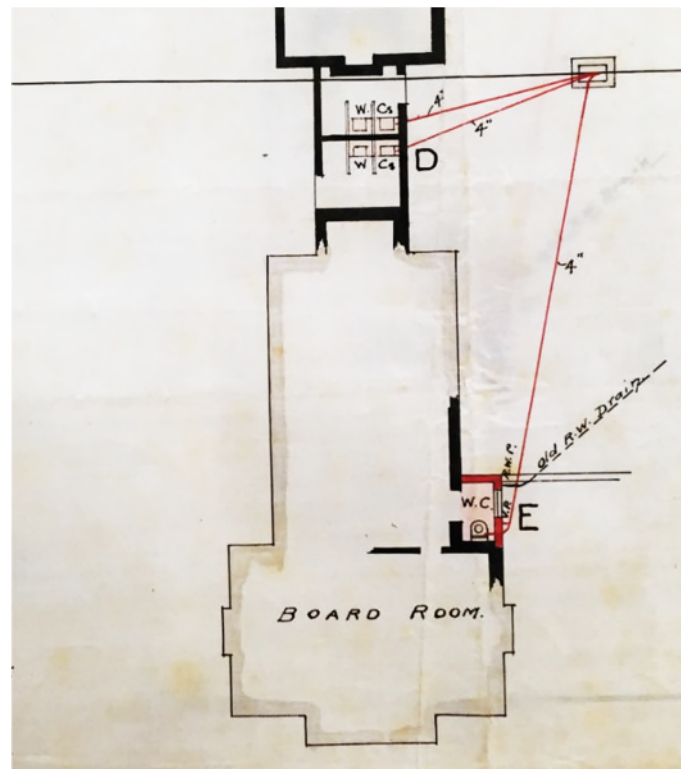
Plan showing proposed WCs, sinks etc. in 1900
